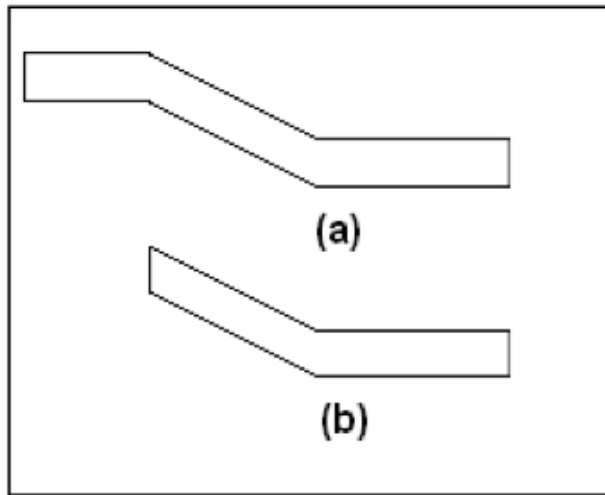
Elevation views of a) Double and b) Single Broken-back Culvert. (FHWA, 2011)
